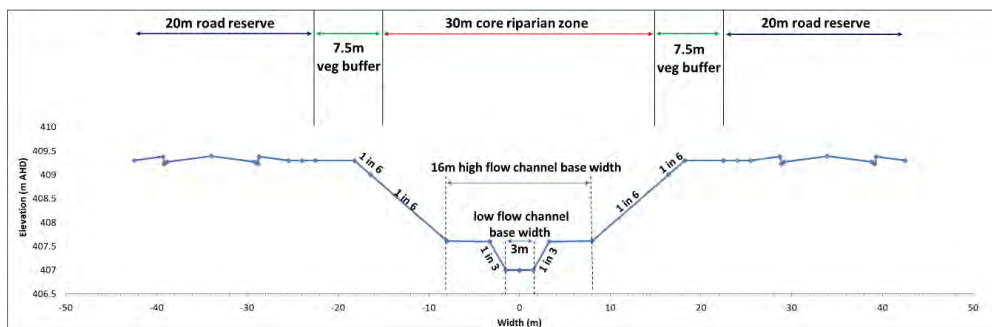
Conceptual arrangement of a typical cross section for a 45m wide waterway corridor
